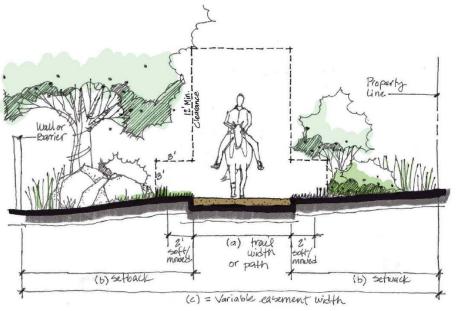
"Town of Queen Creek Park, Trails and Open Space Master Plan"
